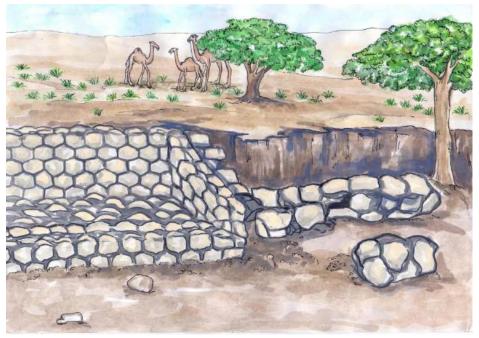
The end of the outer wing wall broke – cement and technical advice will be needed, to rebuild the wall. PADO needs to be contacted.
